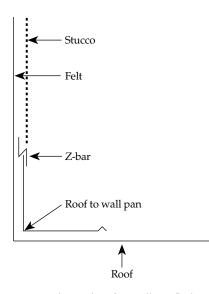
Z-bar and roof-to-wall pan flashing, when properly installed, prevent rodent entry.
